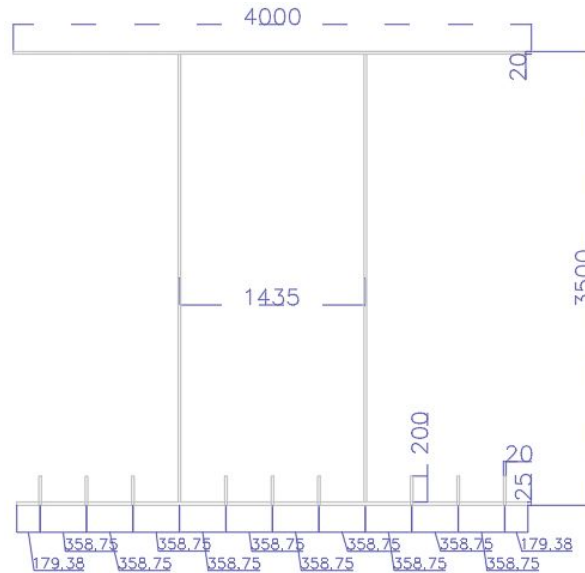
Steel cross-section for class 4 design with only stiffeners at the bottom flange.
